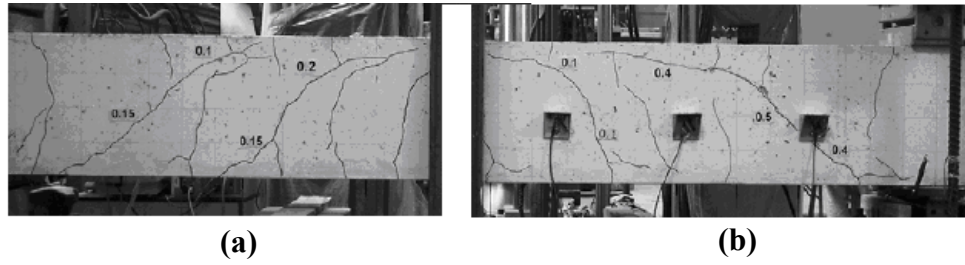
View of Beam SS0a-1 after Test: (a) North Half; (b) South Half
